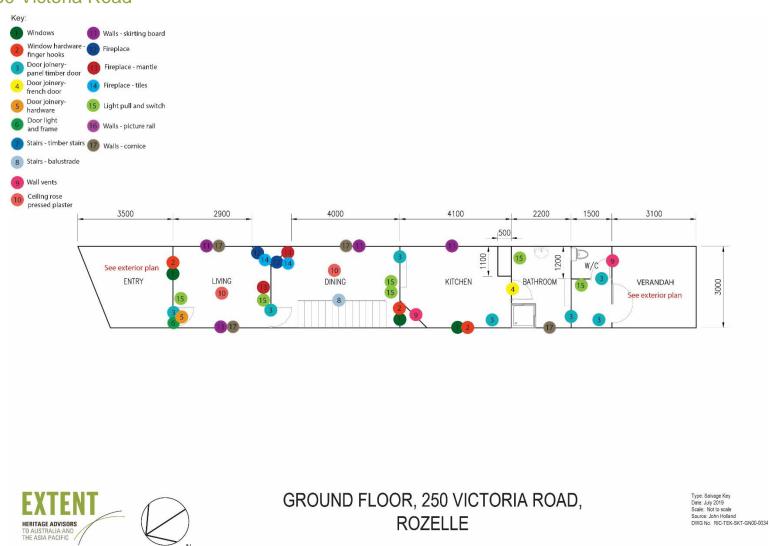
Salvage Plan of Ground Floor of 250 Victoria Road.
